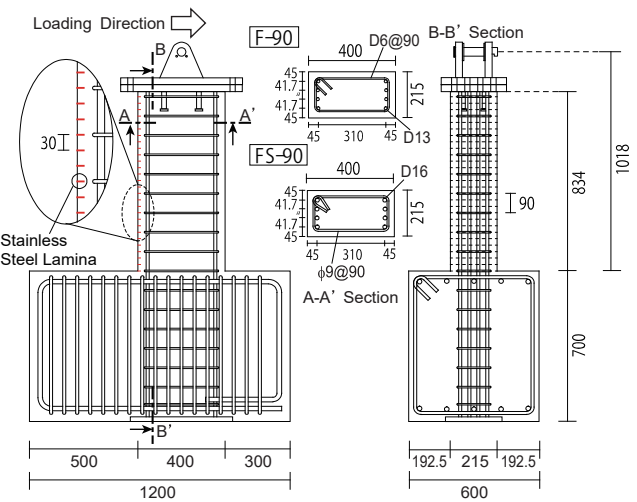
Dimension of specimen F-90/FS-90 [8]
